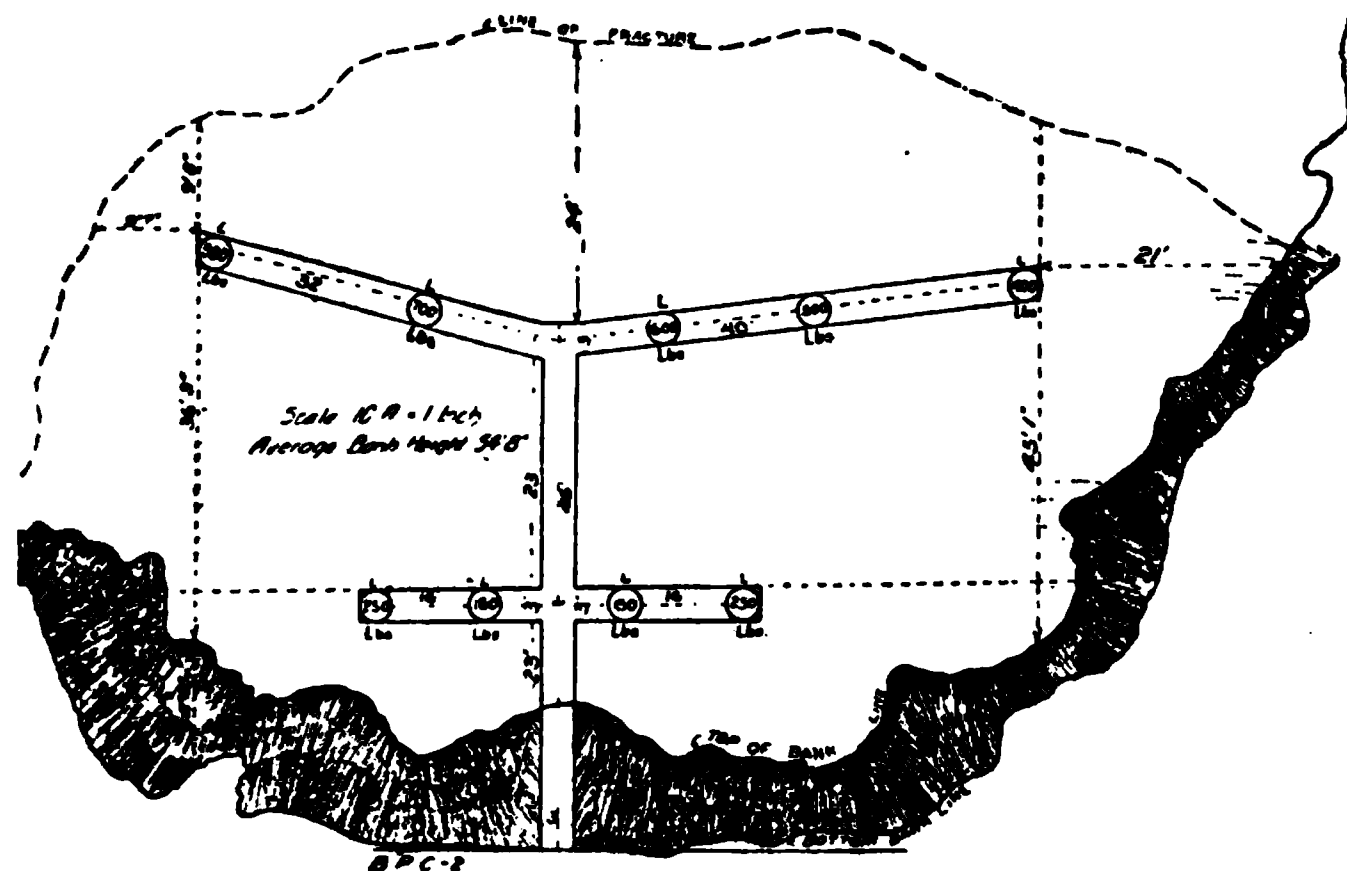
Plan of Tunnels and Charges for a Large Blast at St. Helena, Oregon.
